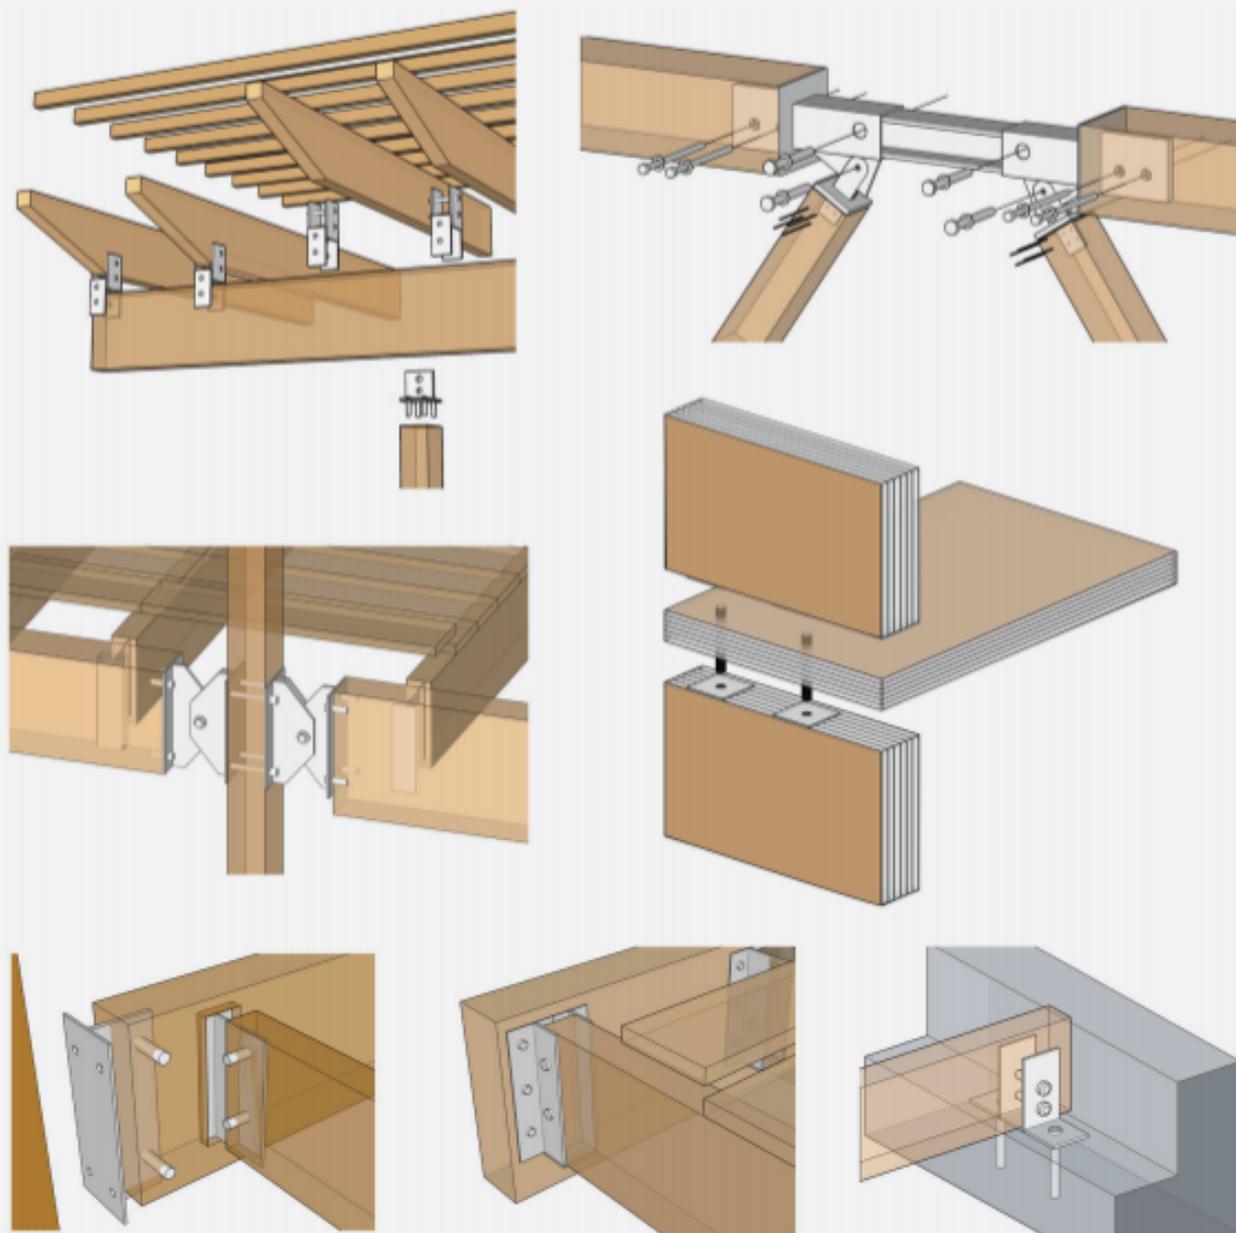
General details shown (left to right, top/down): Roof joist hanger, diagonal bracing bracket, pinned girder/column connection, CLT wall/floor (concealed), recessed (concealed) purlin/girder connection, exposed purlin/girder connection, and timber/concrete intersection
